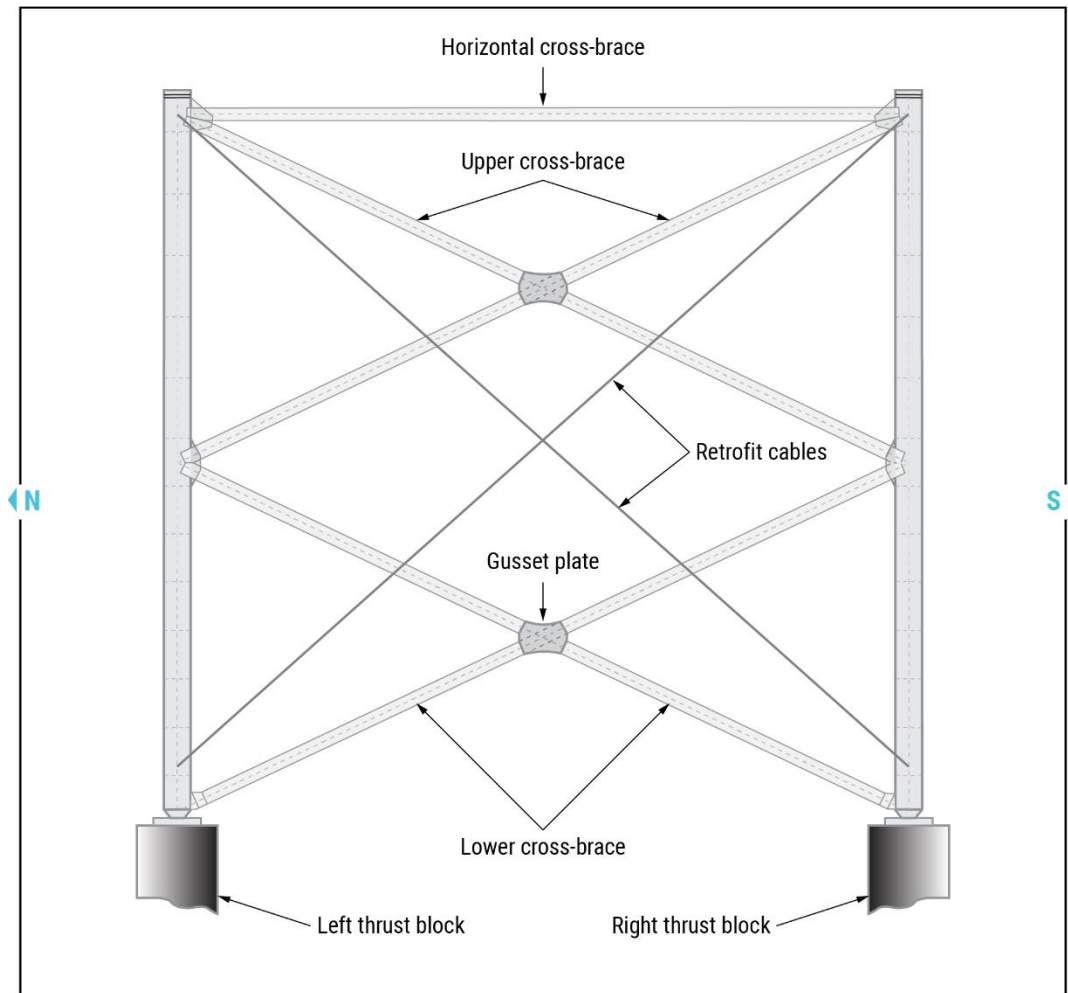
Elevation view of west (near) face of a Fern Hollow Bridge bent, showing original cross-bracing and retrofit cables.
